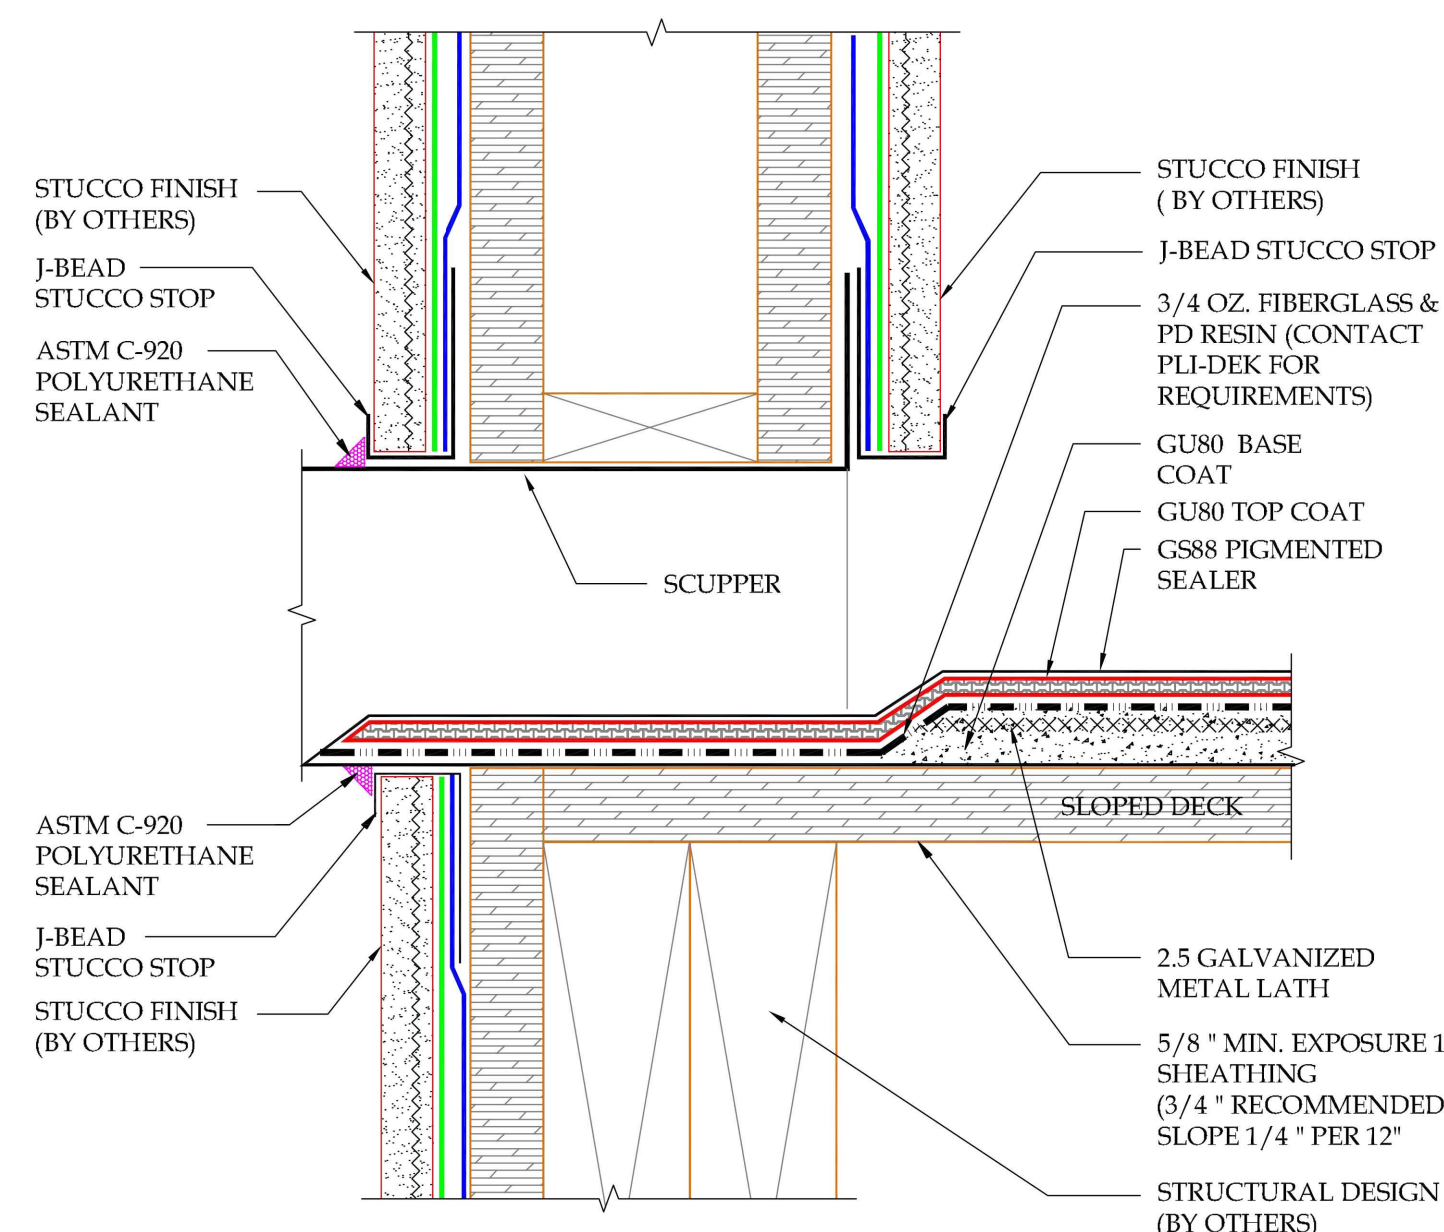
DETAIL-FASCIA TO WALL TO DECK FLASHING INTERSECTION
